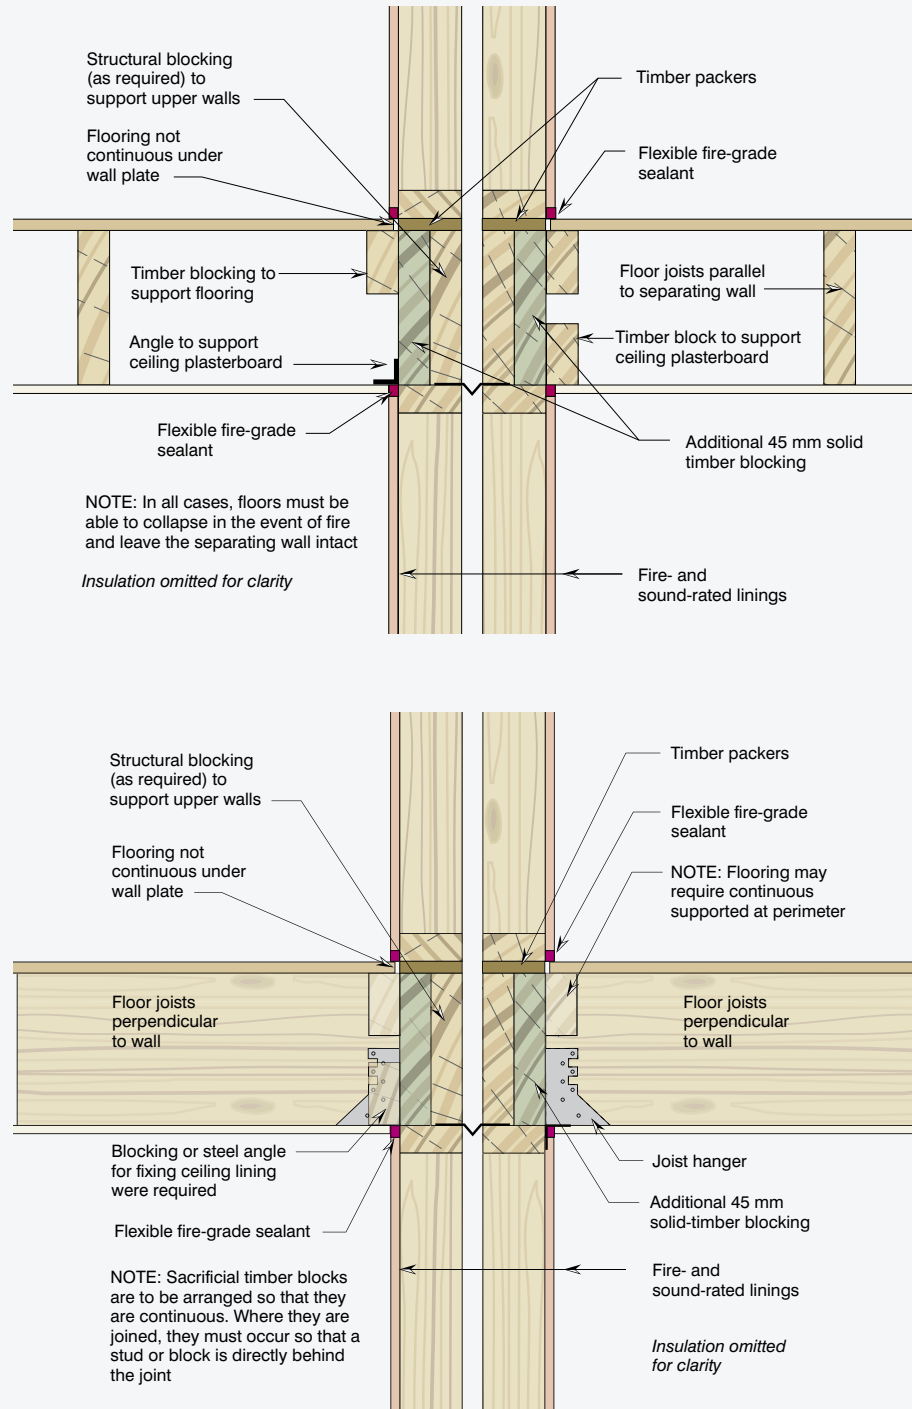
Joist parallel and perpendicular to wall, wall stud not continuous through junction – elevation view.
